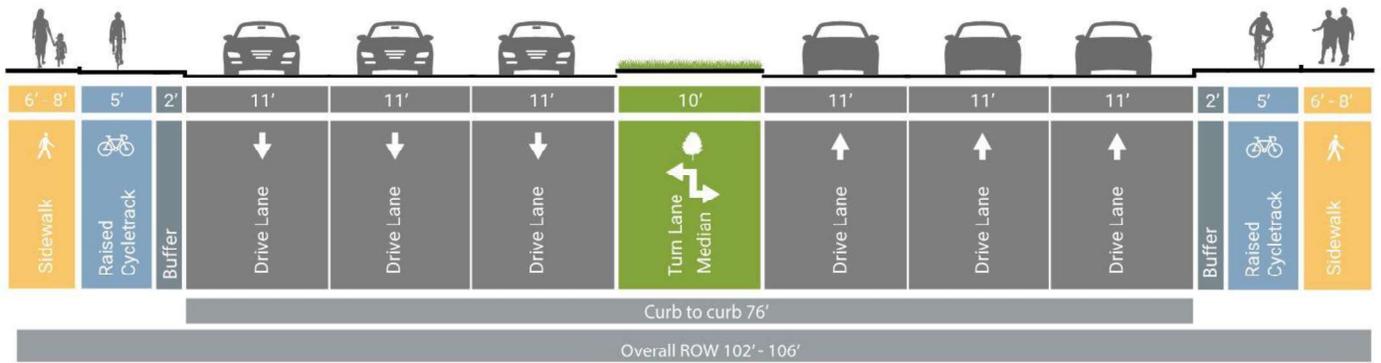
CITY OF HUNTSVILLE EXISTING TYPICAL ROADWAY CROSS-SECTION STANDARDS
